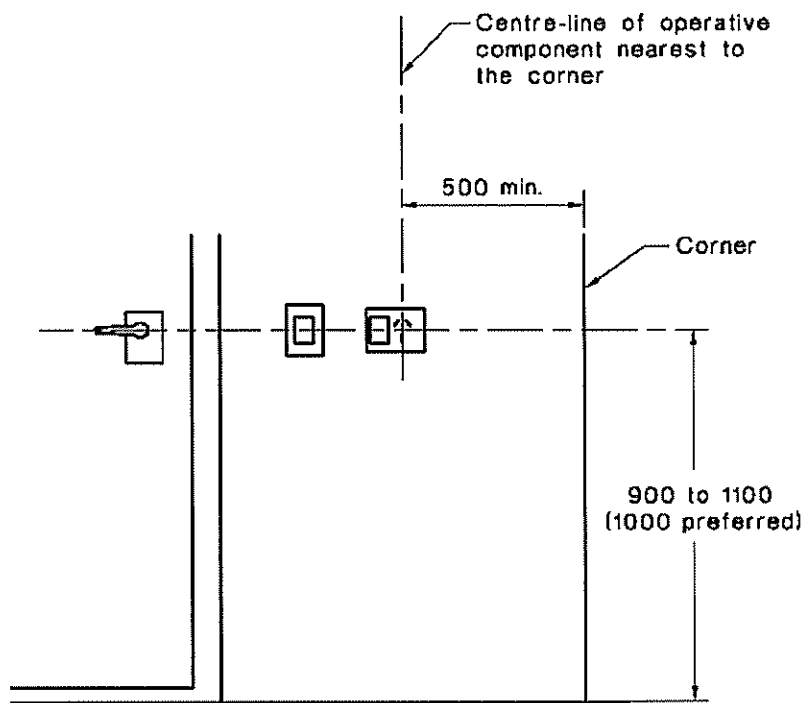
HEIGHTS FOR SWITCHES, GENERAL PURPOSE OUTLETS AND DOOR HANDLES
